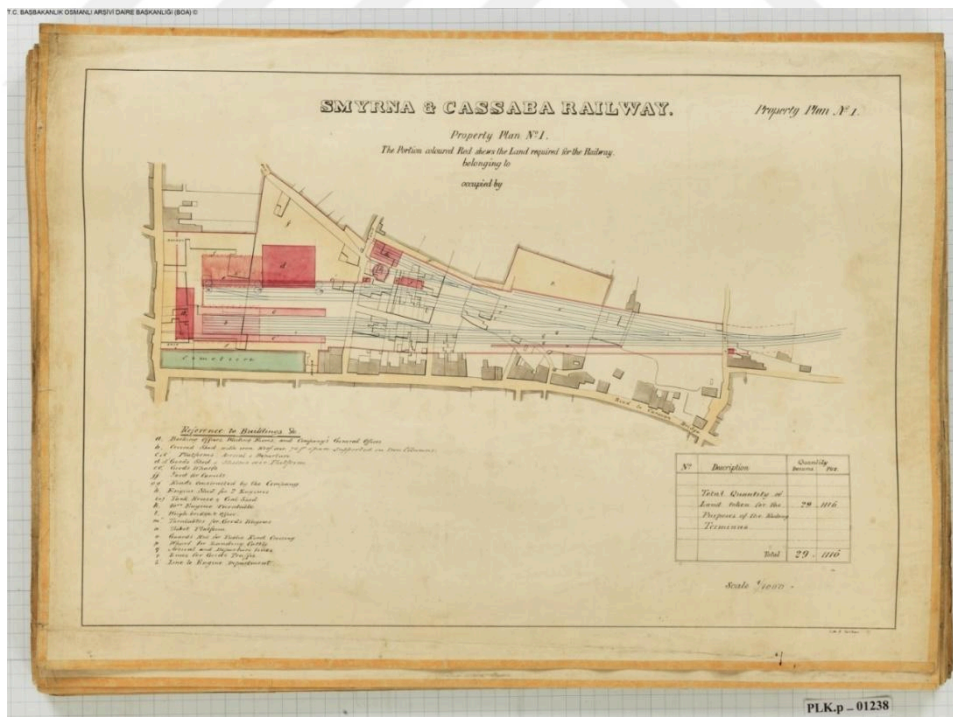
Plan of İzmir-Kasaba Railway, N.1, 1886
